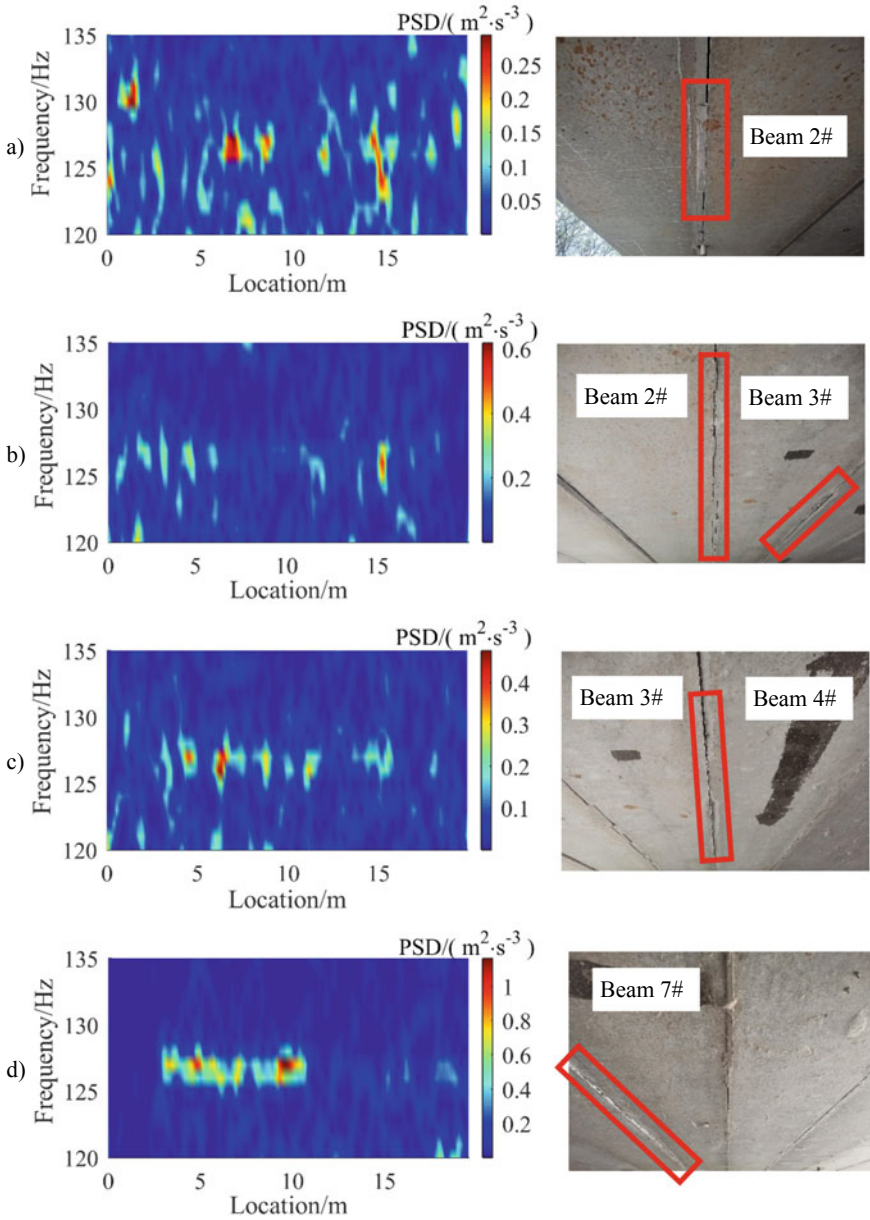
The PSD graph and the corresponding damage of Cai-Jia-He-Zhi-Liu bridge: a beam 2#; b beam 3#; c beam 4# and d beam 7#
